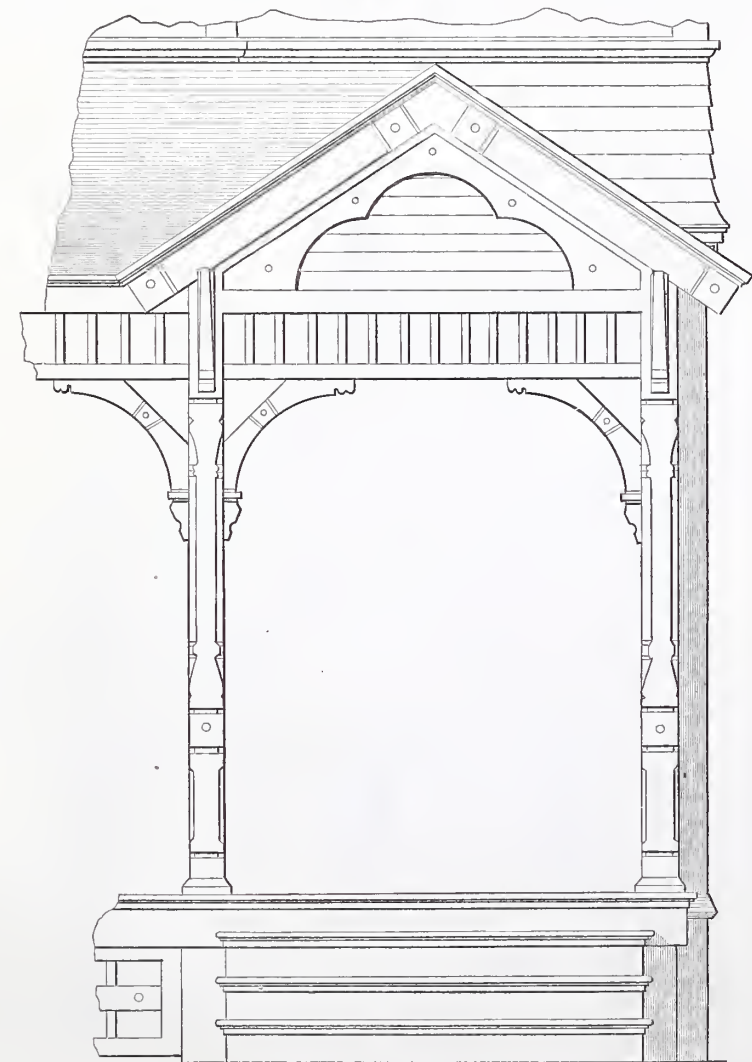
Detail of Piazza, Front Elevation.—Scale, $\frac{3}{8}$ Inch to the Foot.
